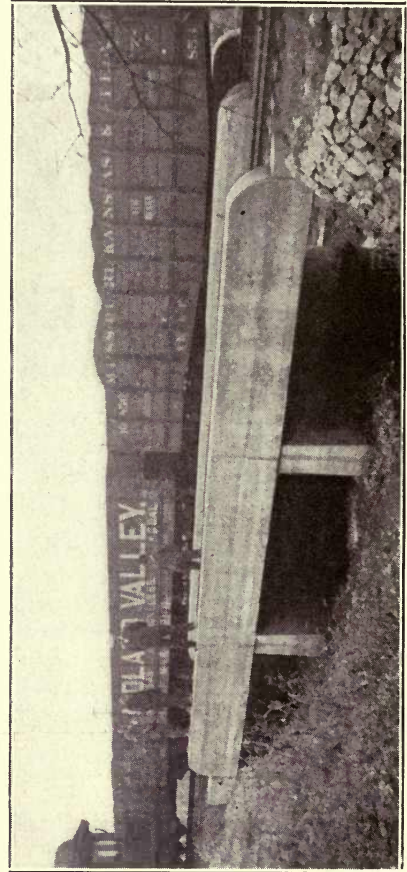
THROUGH GIRDER BRIDGE, C., B. & Q. R. R.
